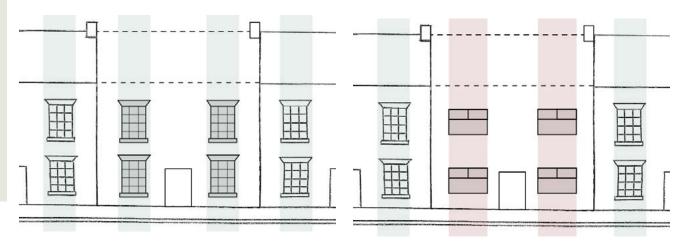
Elevation showing typical building proportion in a detached house. The proportion of a building's elements should be related to each other as well as the scale and proportion of the overall building.
